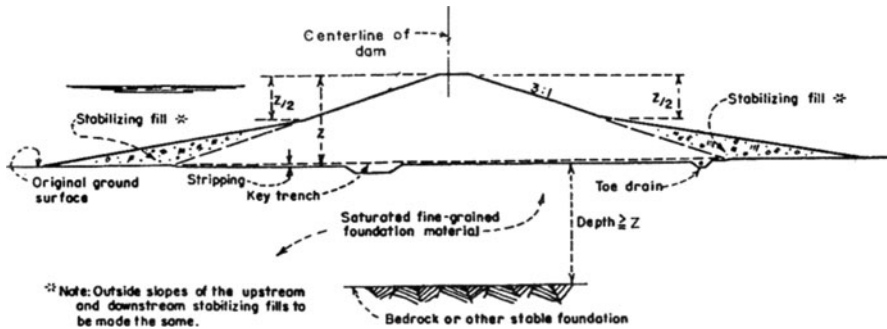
Design of dam on saturated fine-grained foundation.
